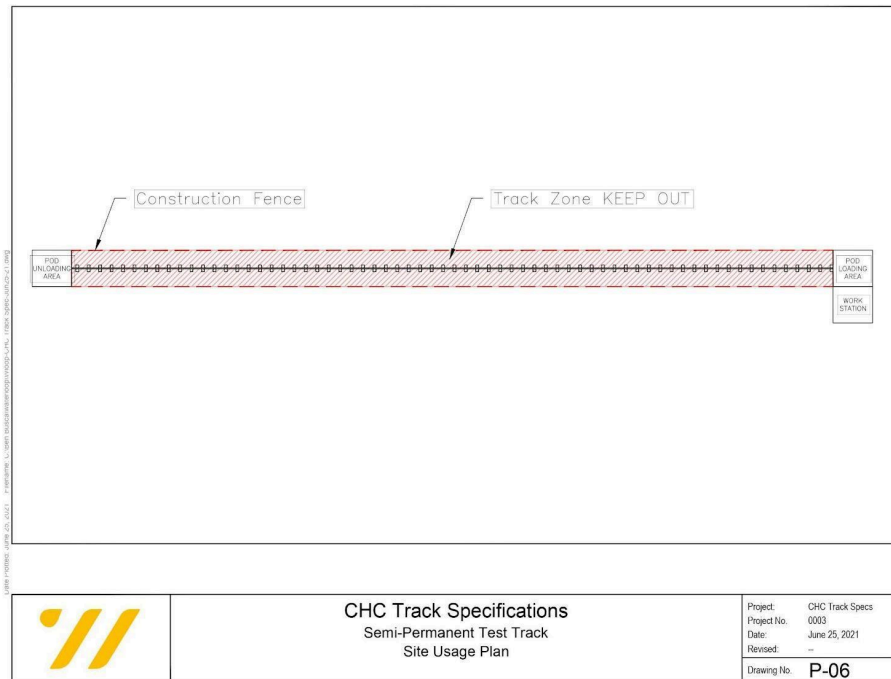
Waterloo Semi-Permanent Test Track Site Usage Plan
